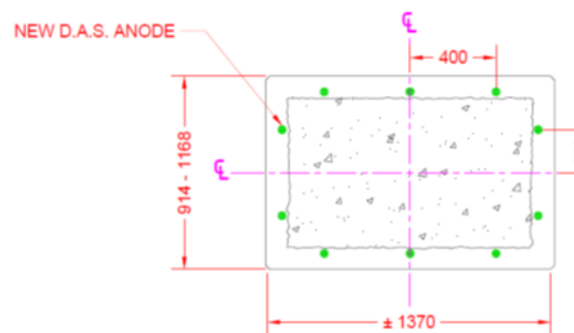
Distributed Galvanic Anode Layout around a Typical Pier Column
